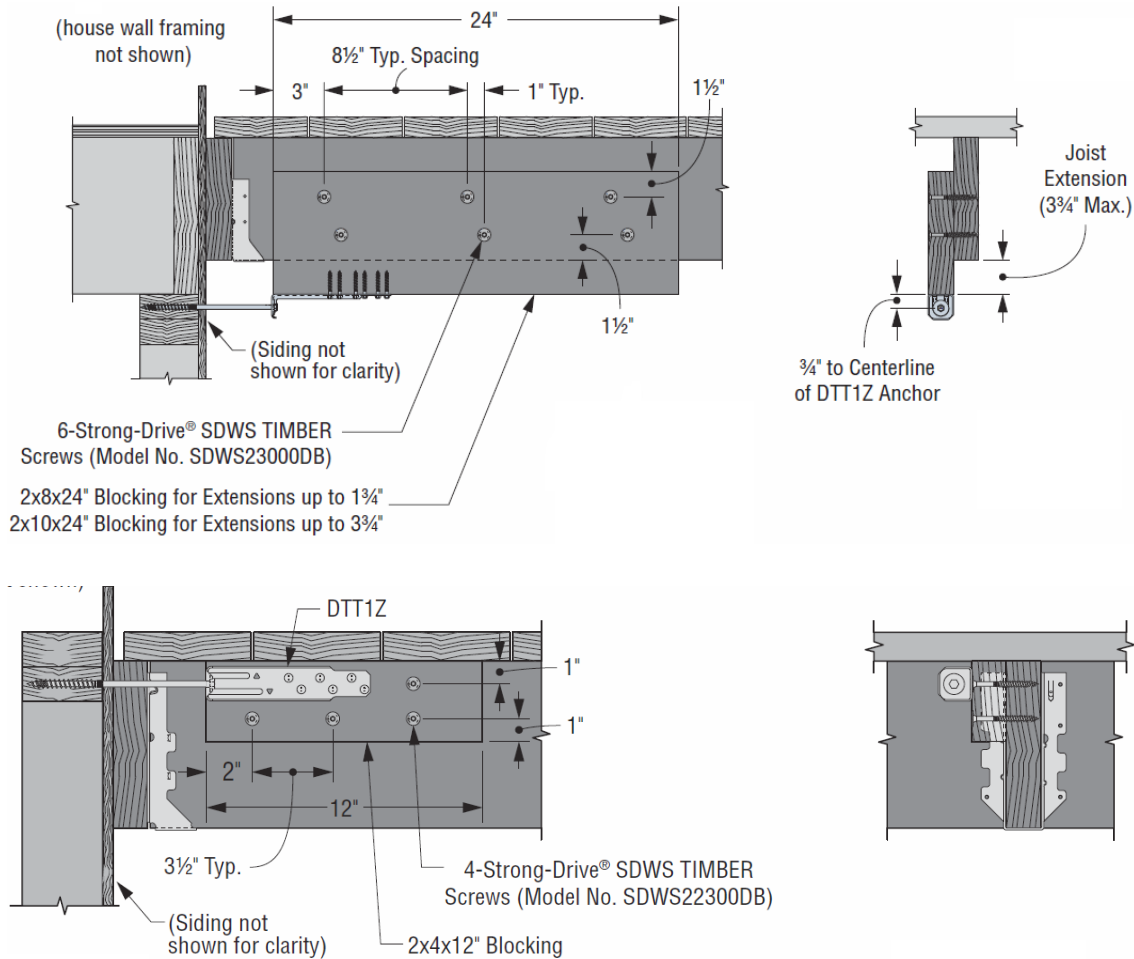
Attachment of Free Standing Deck to House for Deck Stability
